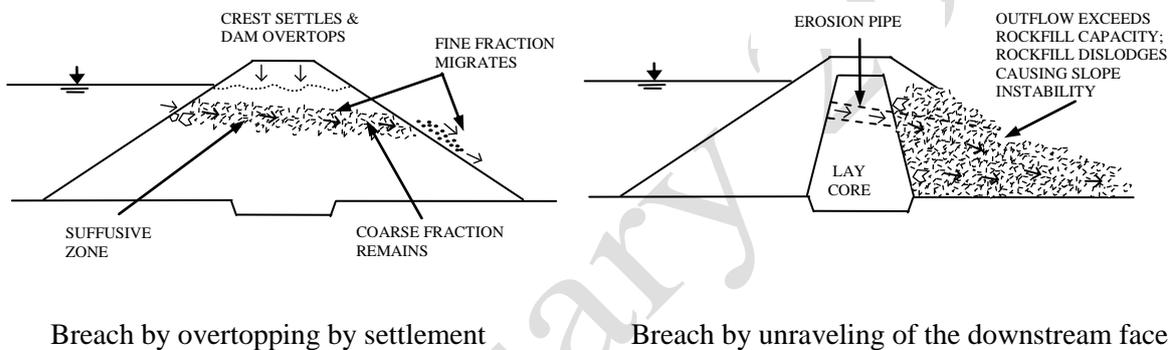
(b) Potential breach (failure) phenomena-overtopping by settlement and unraveling of the downstream face, Fell and Fry (2007)
